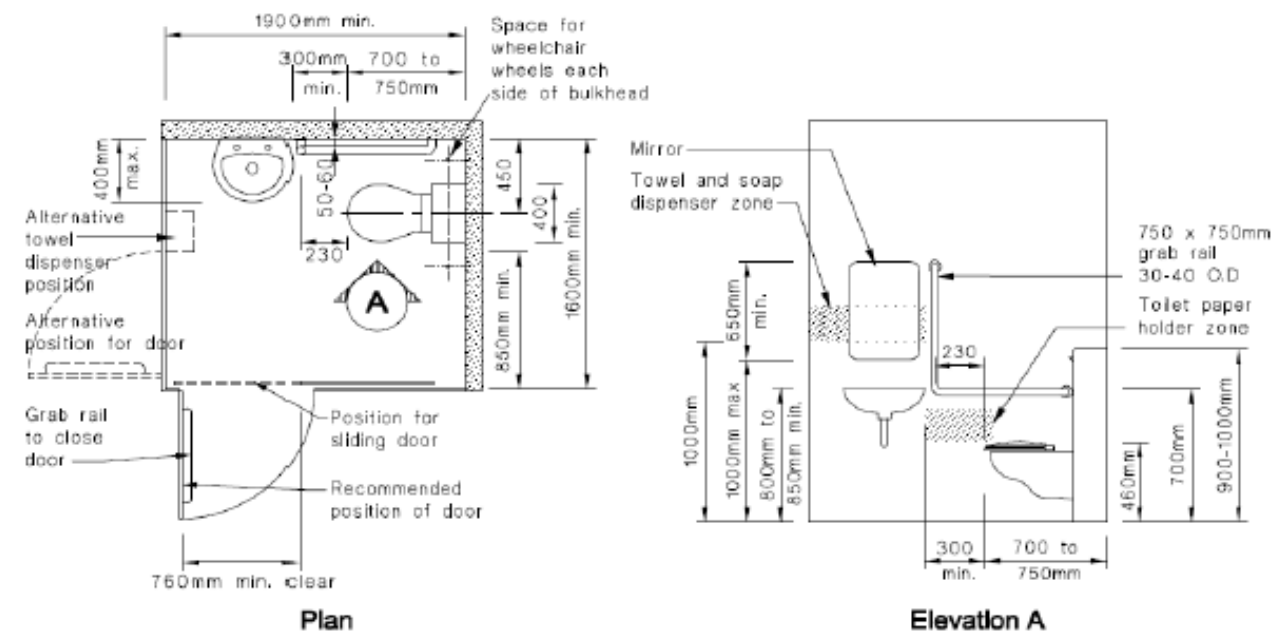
and 7 from the New Zealand building code clause G1/AS1. Note the floor plan sizes are minimum dimensions.
